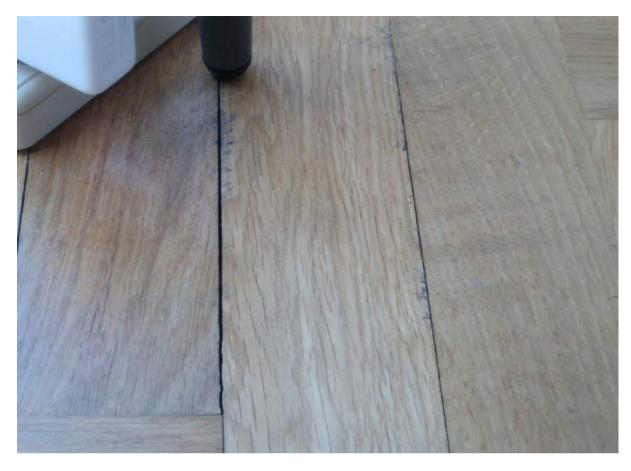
Water damage to parquetry flooring at living room window assembly in Unit 306.
